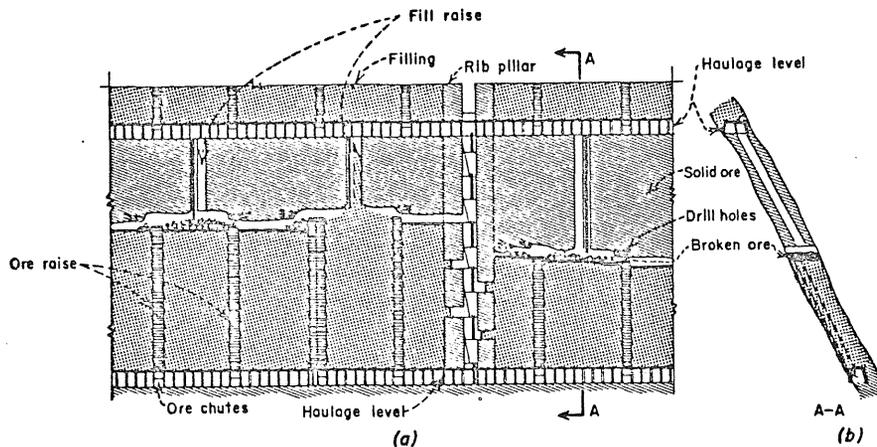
Cut-and-fill (Jackson and Gardner⁷).
